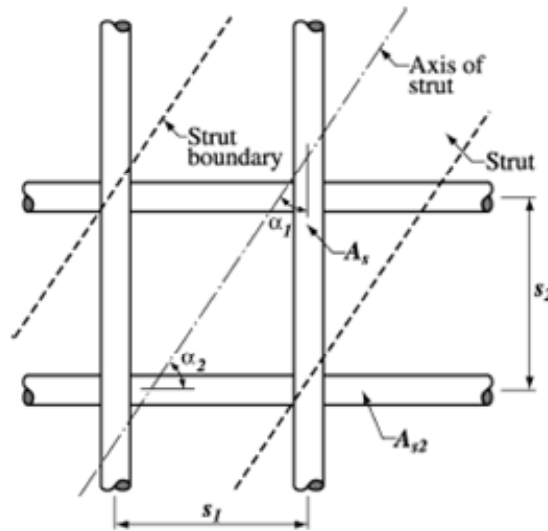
Reinforcement cross a strut (ACI 318 2008)
